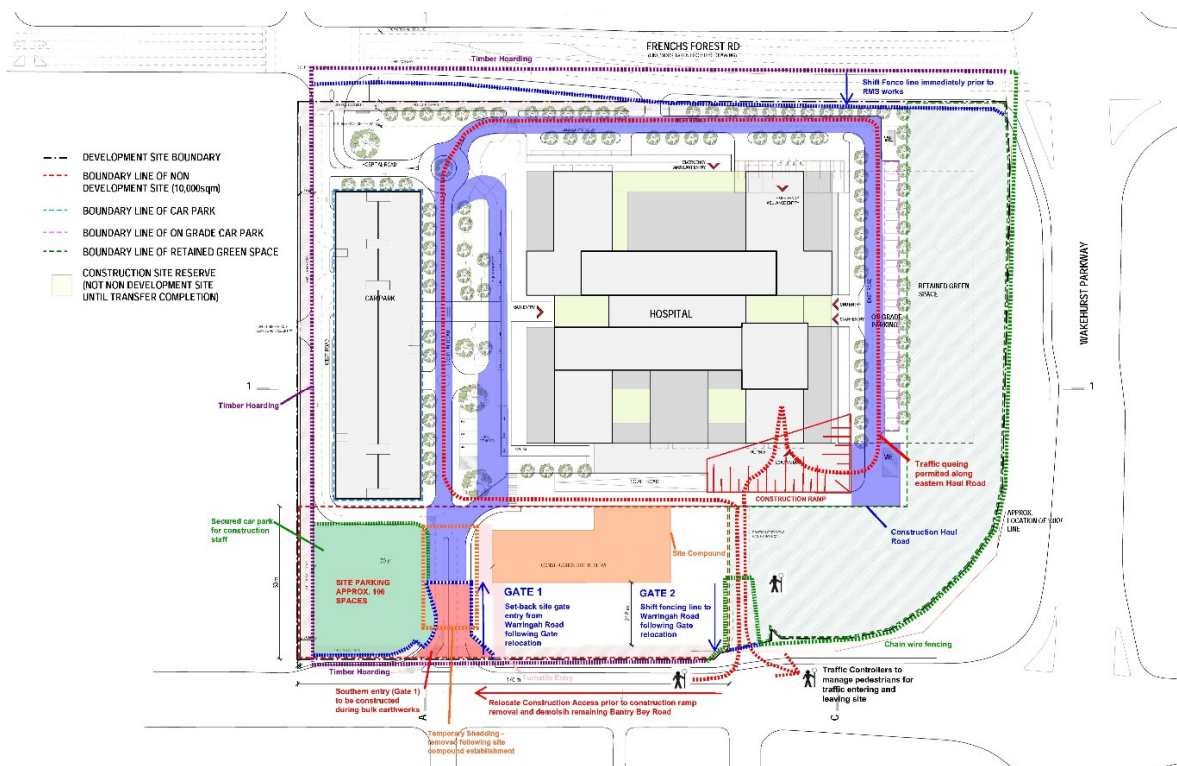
Site layout, parking and accommodation during Hospital Road entry construction
